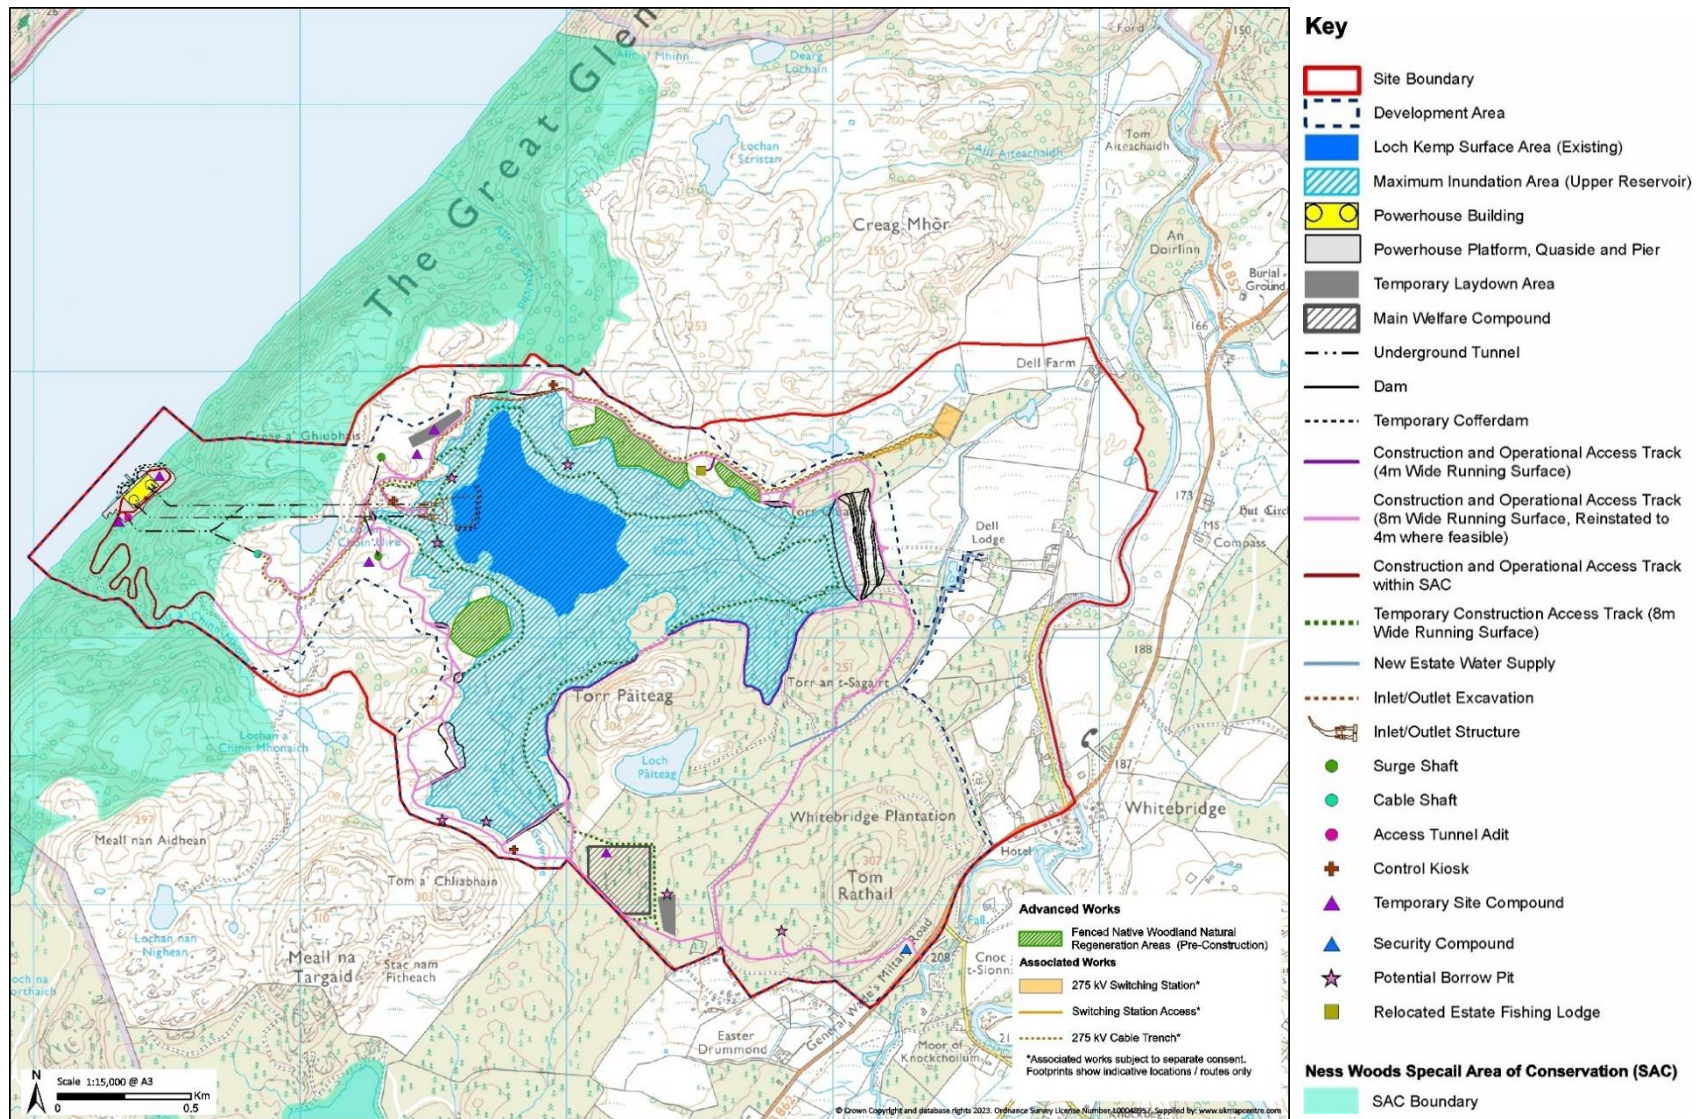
Site Layout: Loch Kemp Storage Scheme and the Ness Woods SAC
